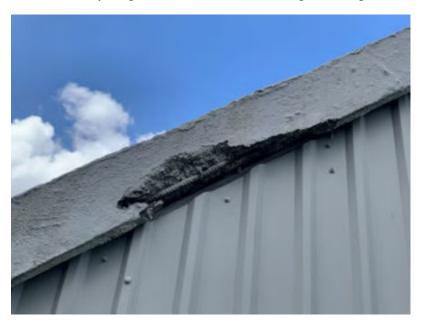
Severe concrete spalling and exposed unprotected steel reinforcing at structural support.
